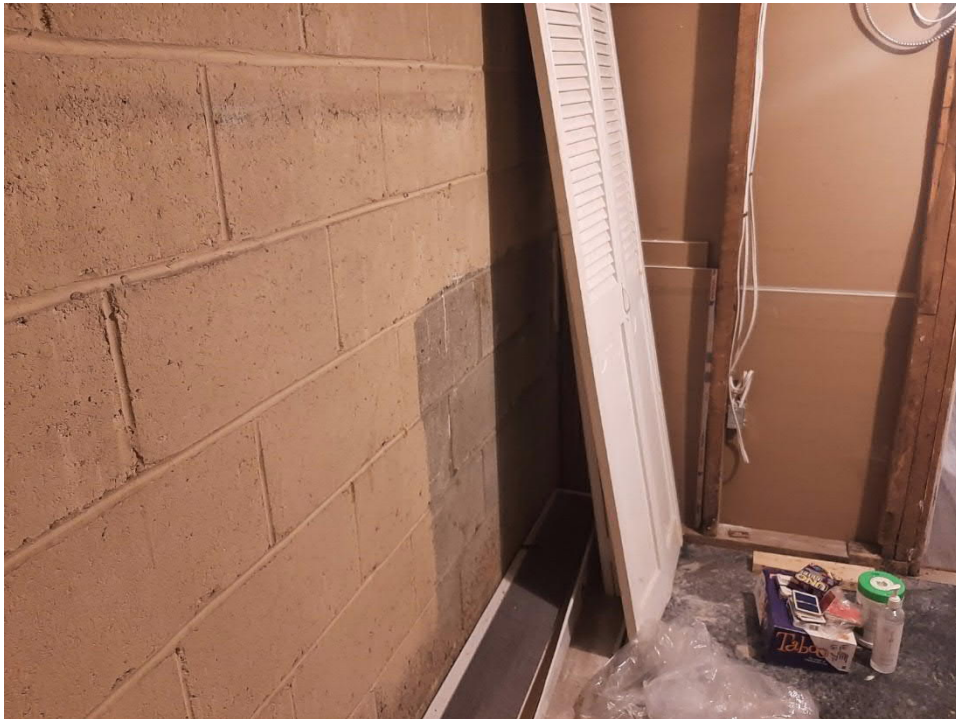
View of a sump in the southeast corner of the Site building basement.
